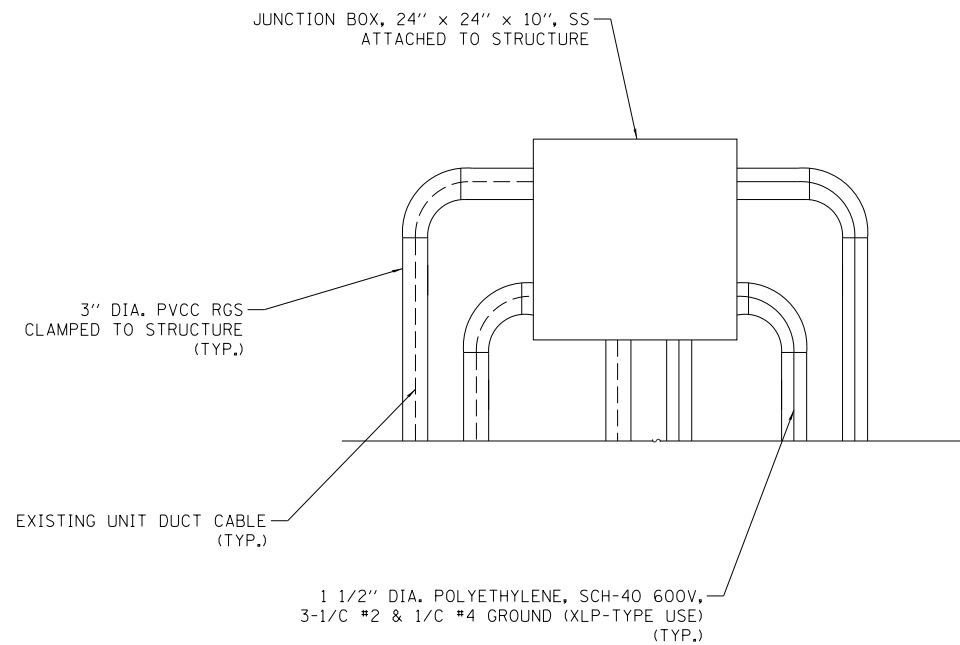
DETAIL D- CANFIELD ROAD/ORIOLE AVE.
